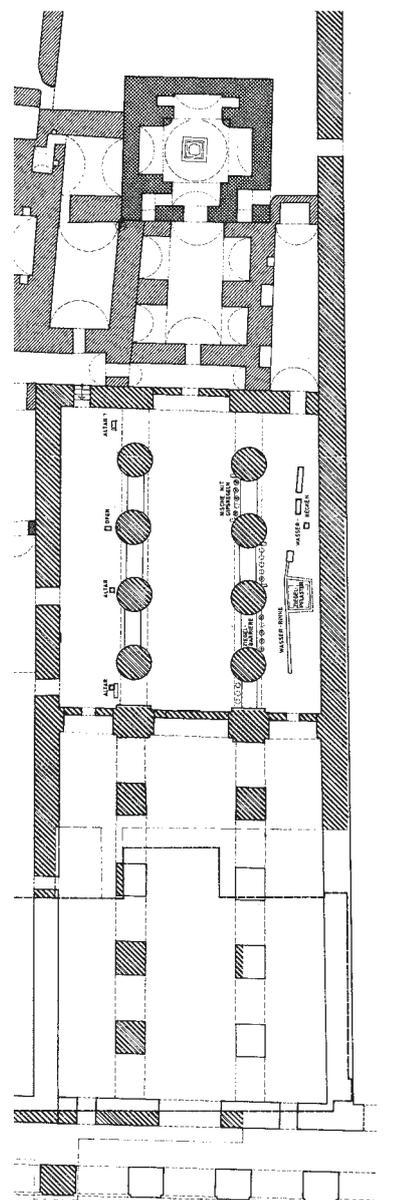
Takht-i Sulaymān, pillar hall and columnar hall with axial rooms, ground plan. – (Dietrich Huff; after Kröger, Stuckdekor fig. 79. Detail).
